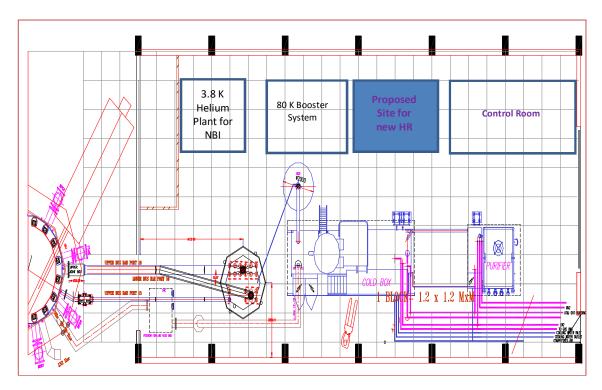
Available space dimensions and layout drawing at IPR Cryogenic Hall
